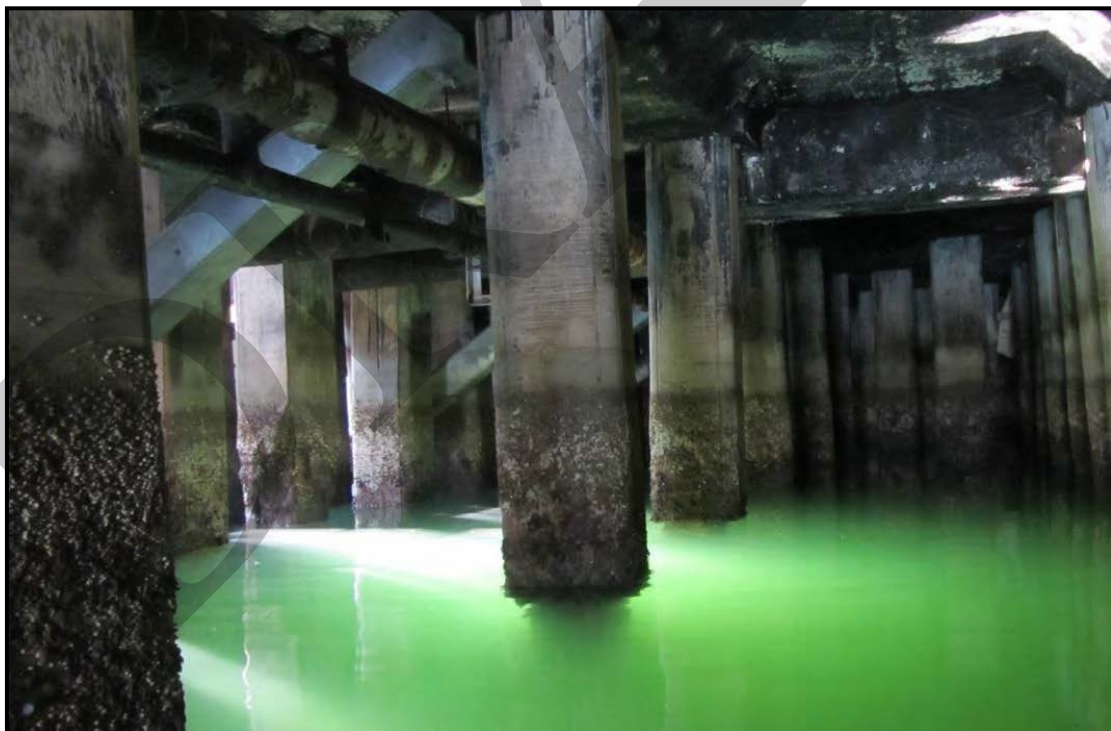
Pier 3 pile with larger extension cast on top of original pile (original pile visible below water).
